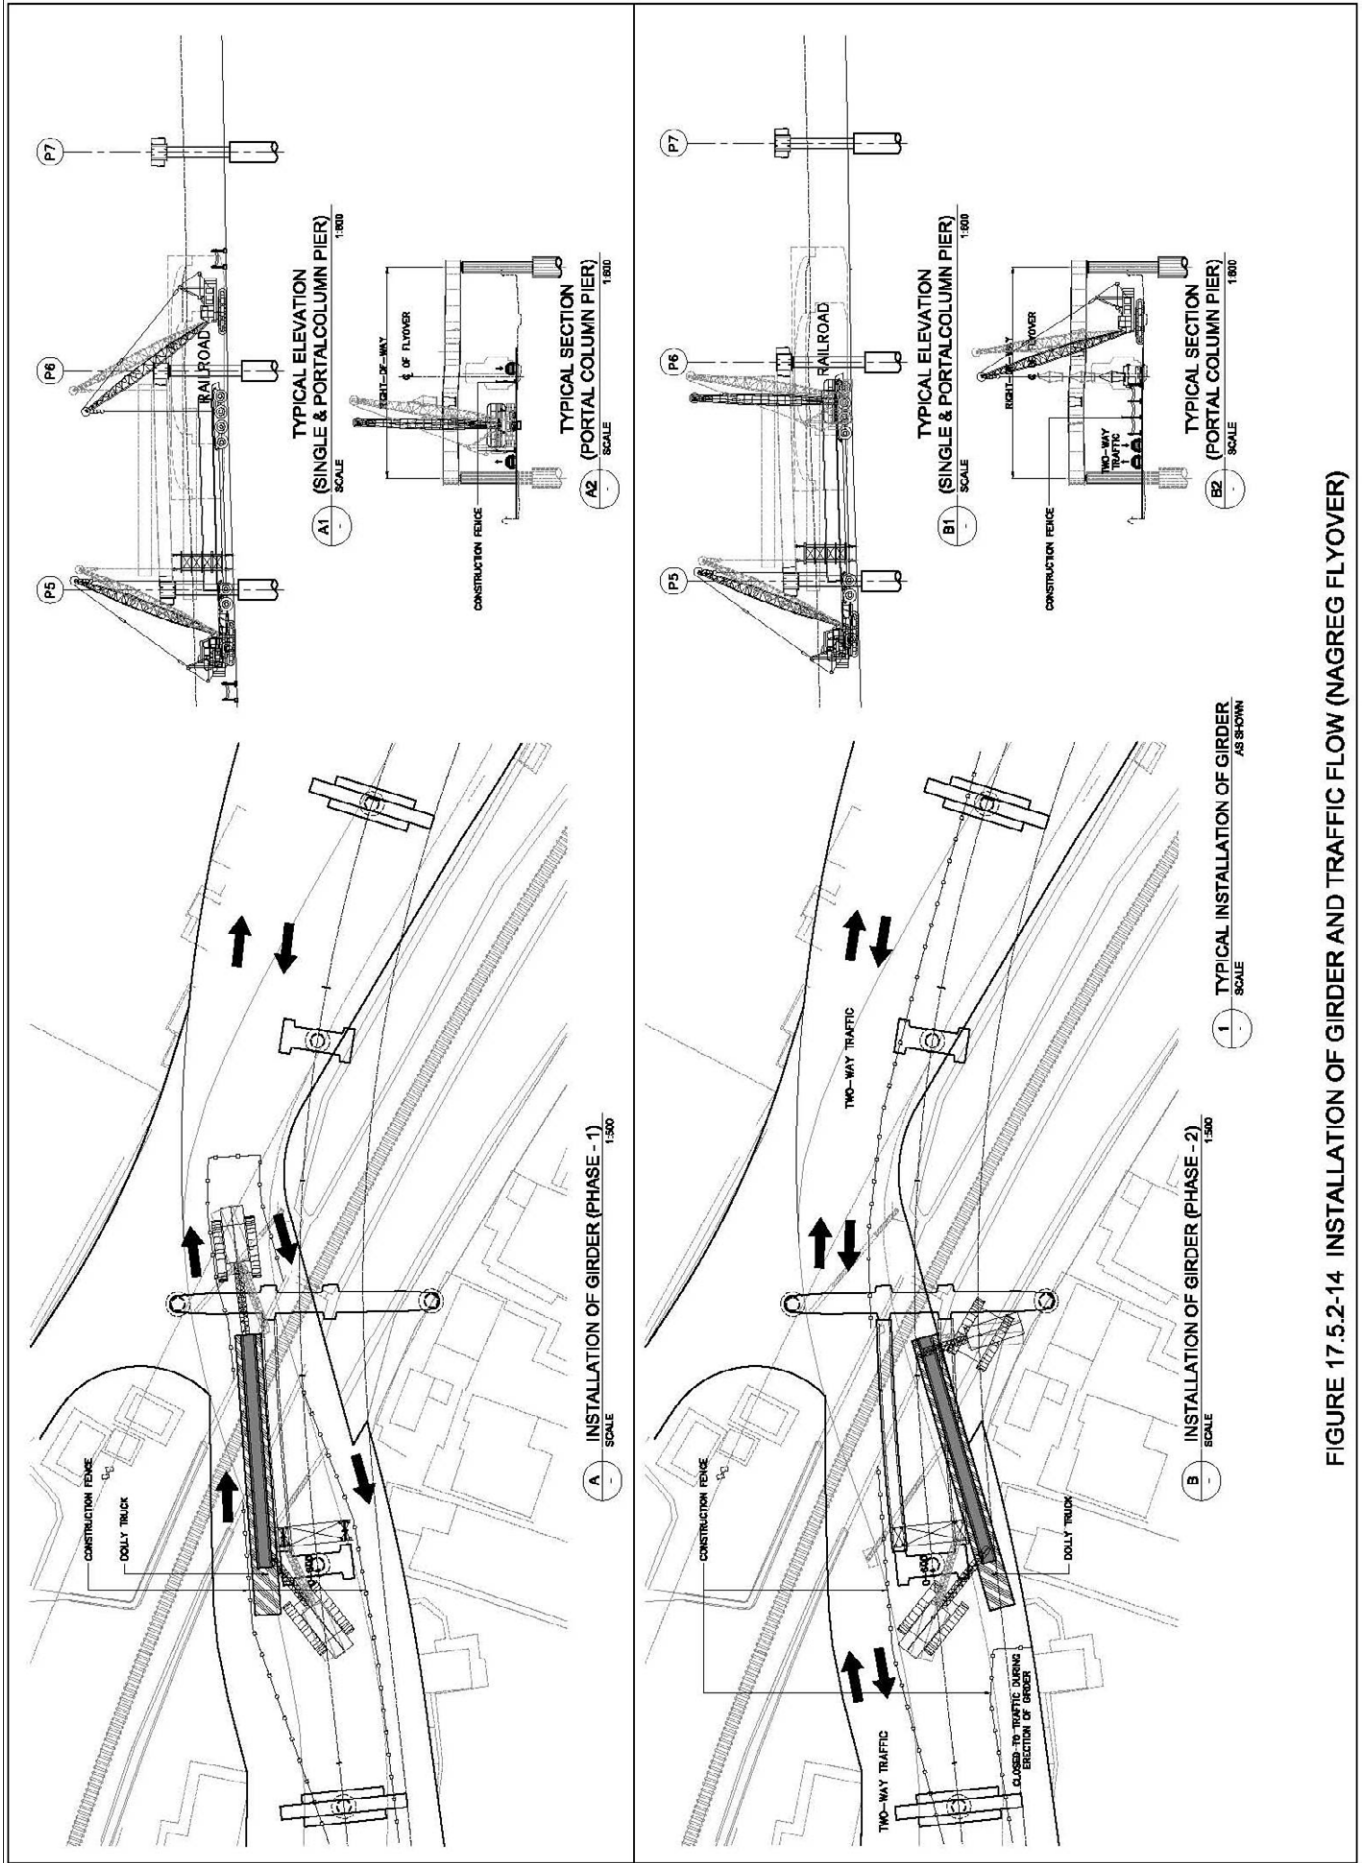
INSTALLATION OF GIRDER AND TRAFFIC FLOW (NAGREG FLYOVER)
